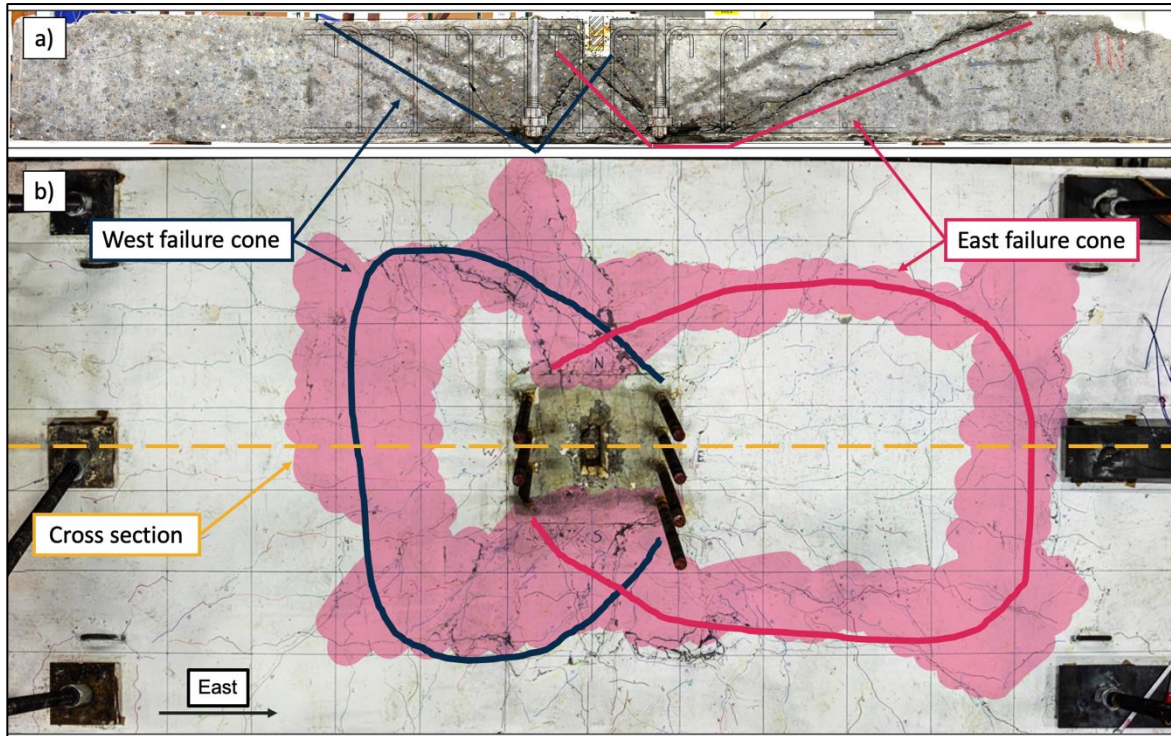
a) Specimen cross section and b) plan view highlighting crack patterns and breakout cone geometry, with 12-in. x 12-in. [305 mm x 305 mm] grid for specimen M02. The shaded region produced a hollow sound when knocked.
